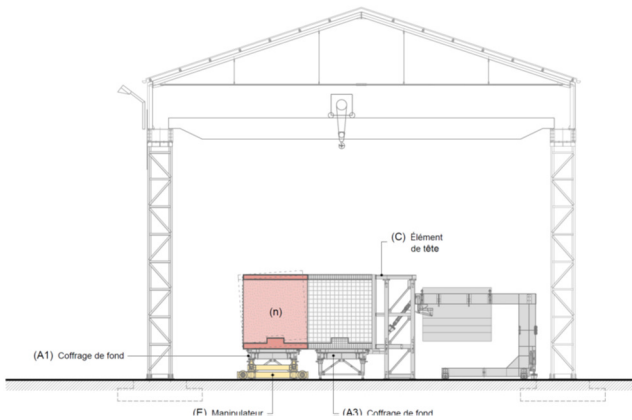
Cross section of precasting building / Sezione trasversale del capannone di prefabbricazione
